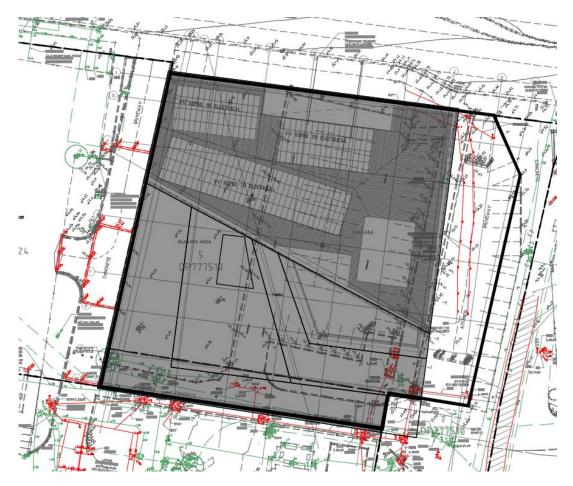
Proposed Catchment Plan (hatching represents roof catchment)
